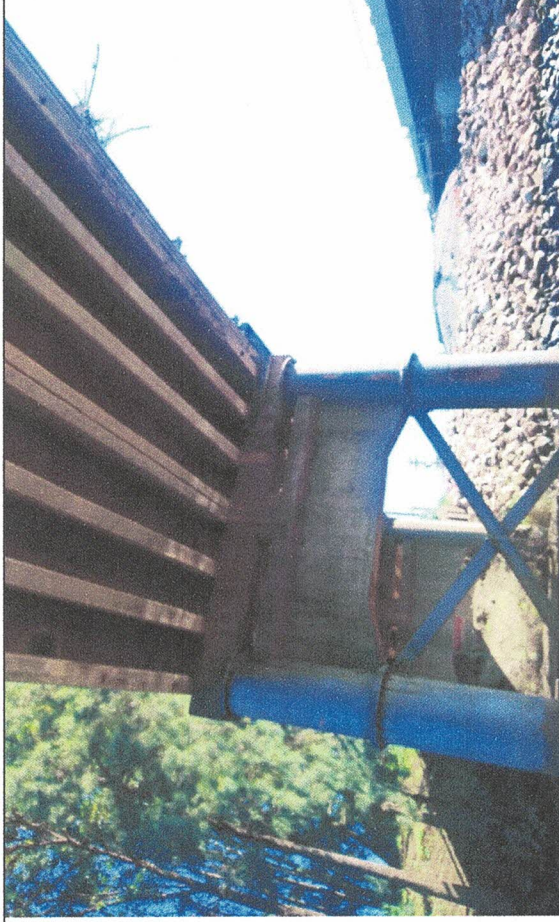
Underside of Bridge Deck : Fourth Span from Southern Abutment
